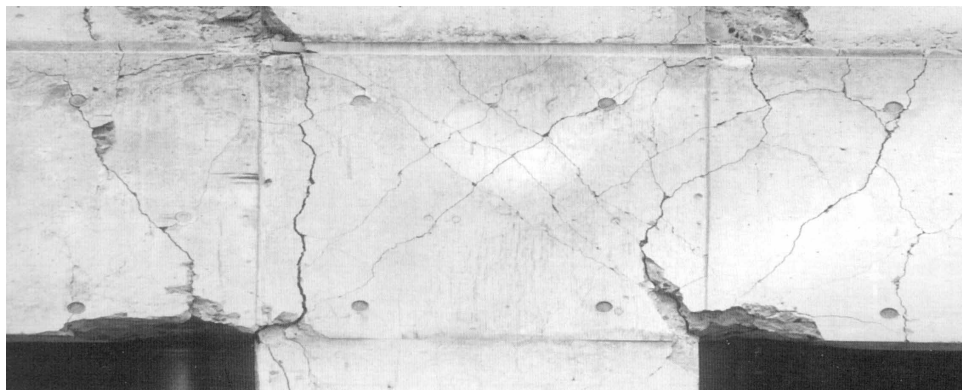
Cracking Pattern of a Building Damaged in 1995 Kobe Earthquake [5]
